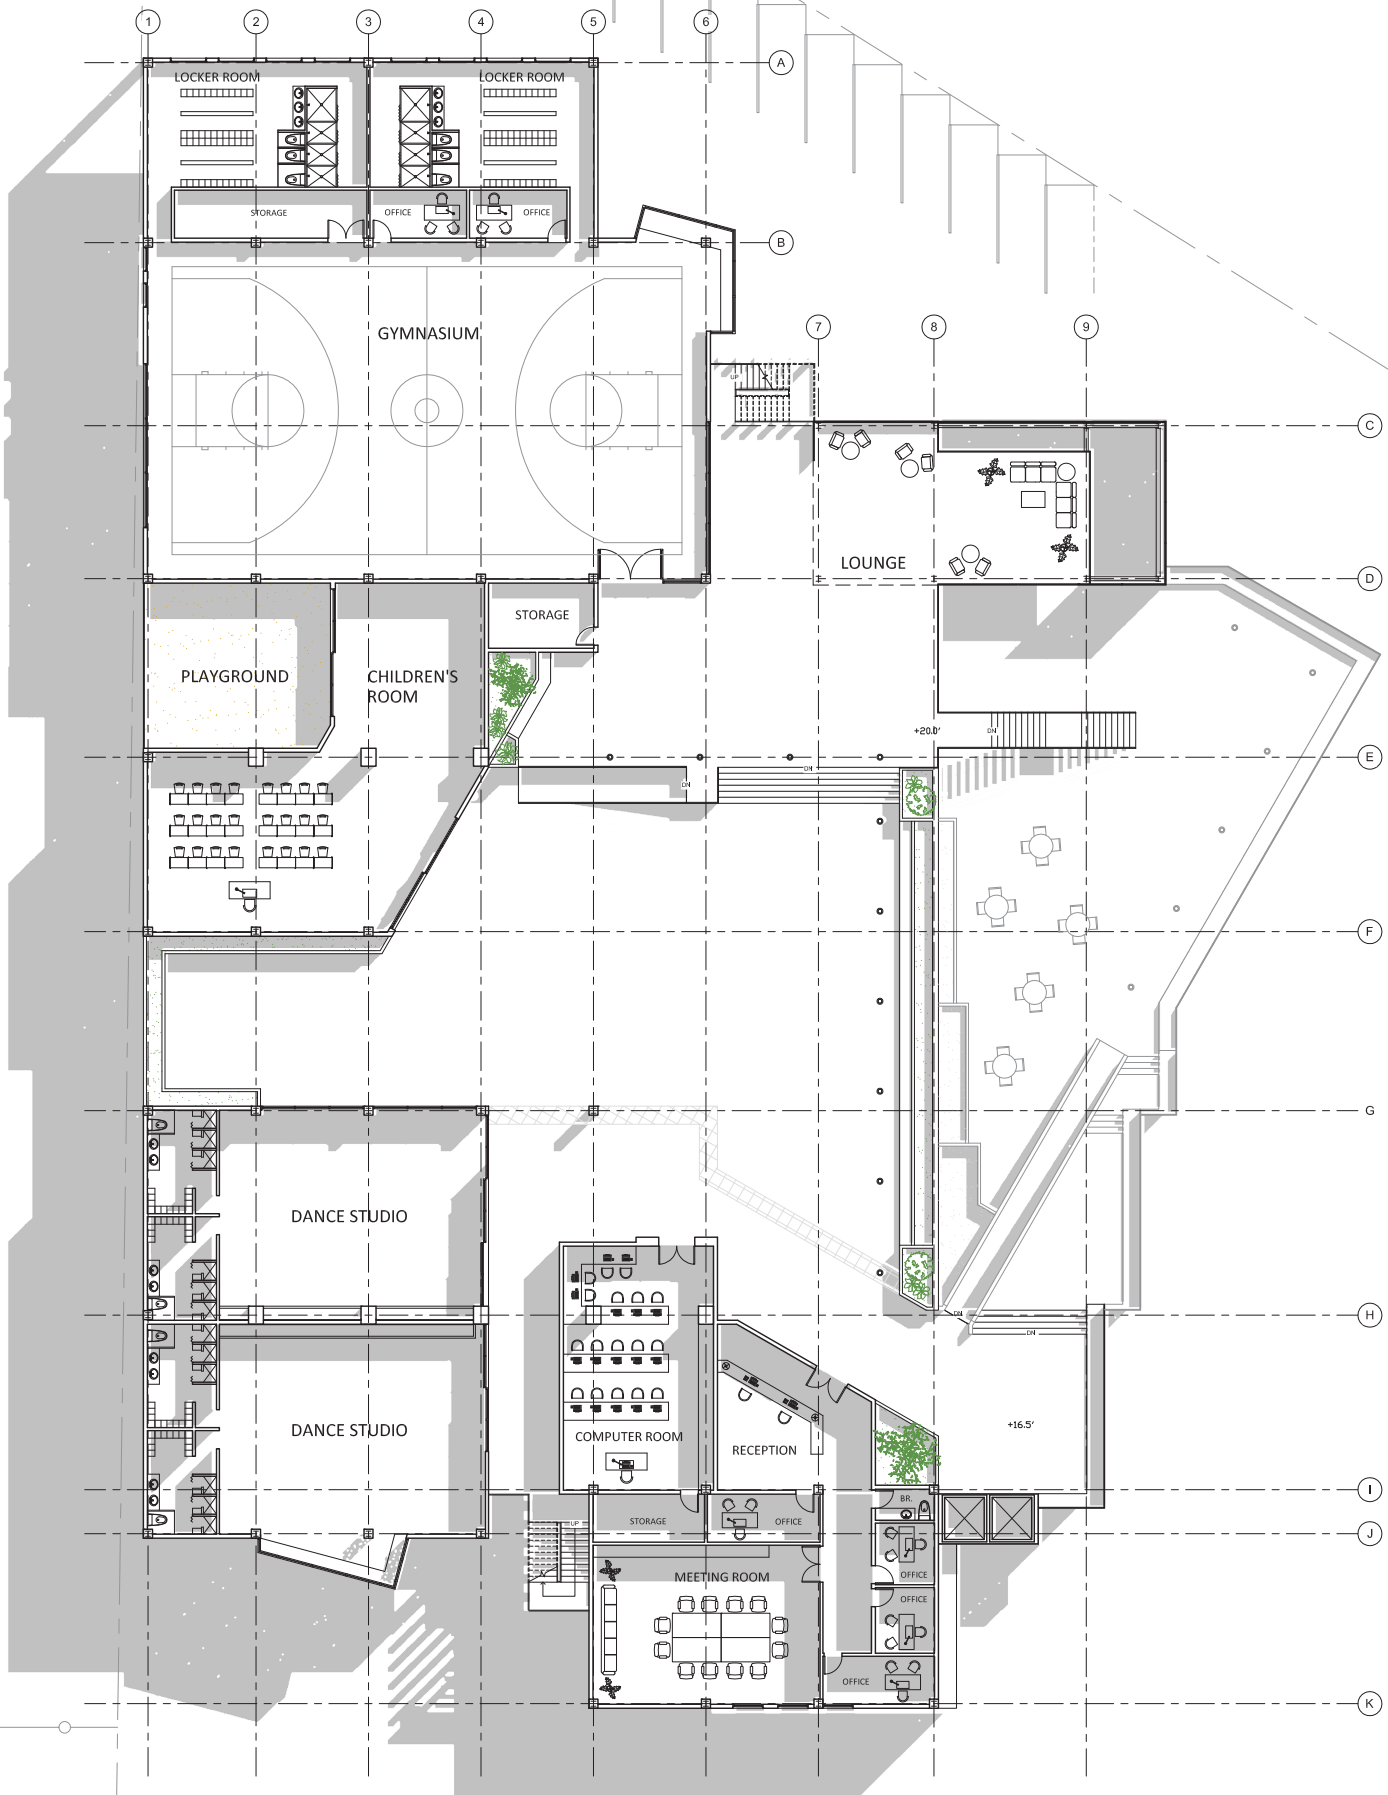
Final Design Prototype Third and Fourth Floor Plan
